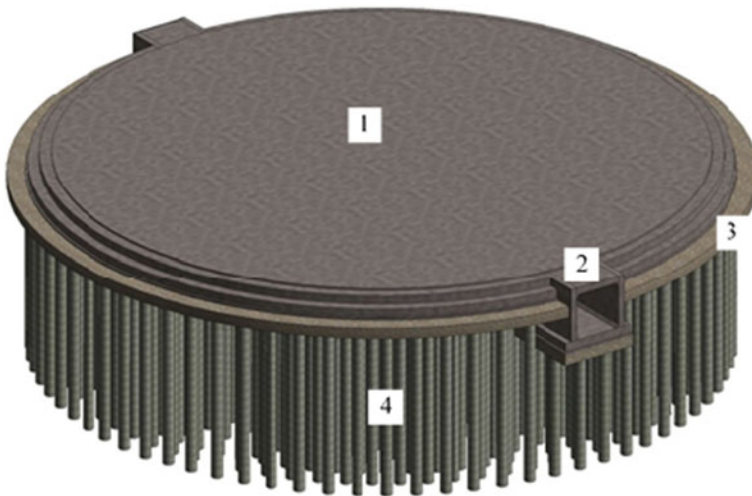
Structural layout of the foundations of grain storage silos on a reinforced basis: 1–foundation slab; 2–underground gallery; 3–damping layer of crushed stone; 4–soil–cement elements
